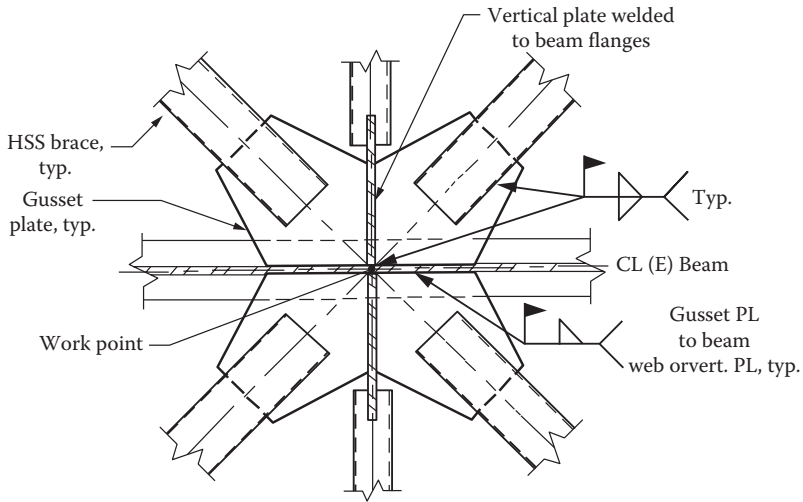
Horizontal braced frame connection. *Note:* Elevation of horizontal braced frame with respect to diaphragm is a balance between minimizing eccentric forces and allowing for construction access from below.
